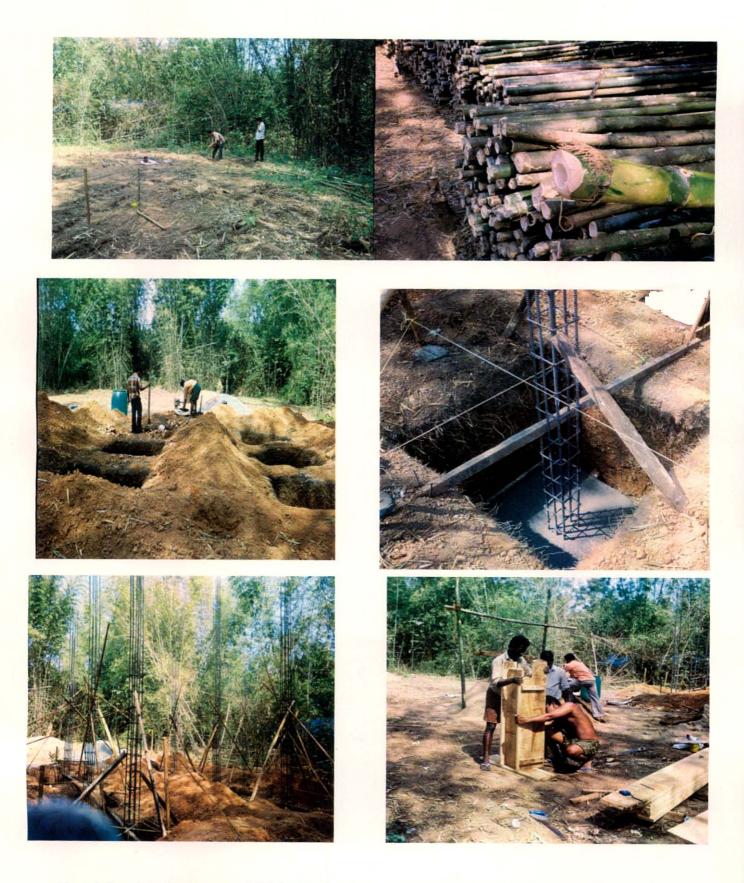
Construction stages – Initial activities: Site preparation, bamboo collection, earth work, construction of columns, etc
